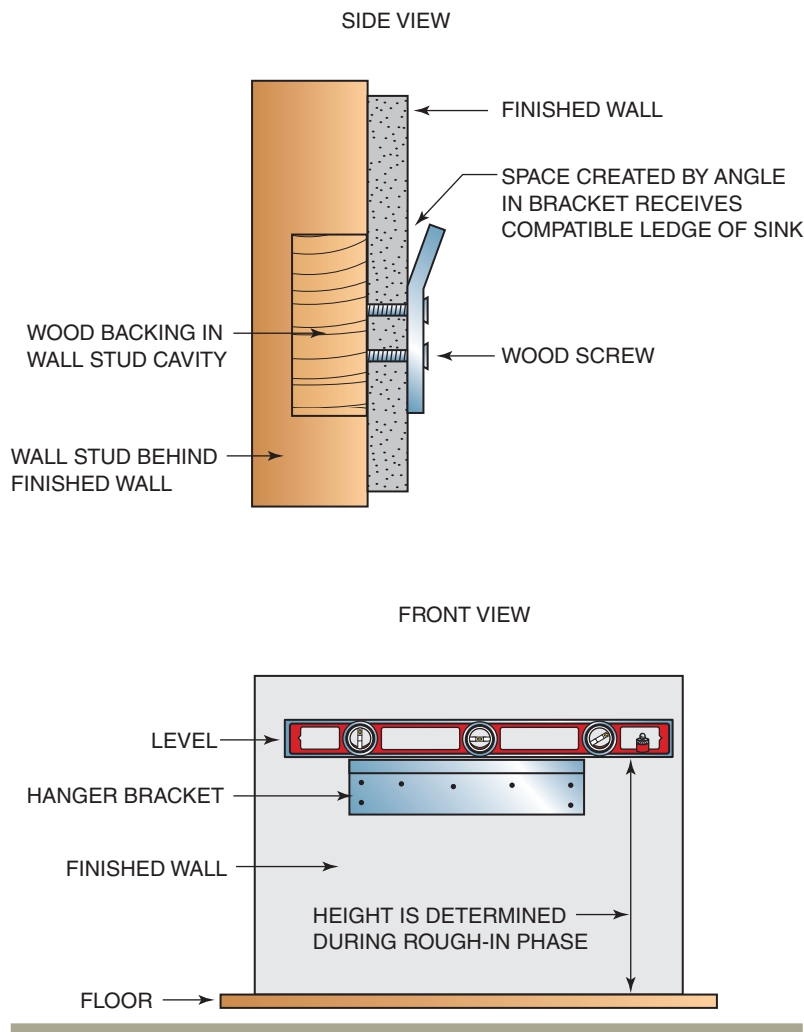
A hanger bracket is installed on the finished wall to install a wall-mounted laundry sink.
